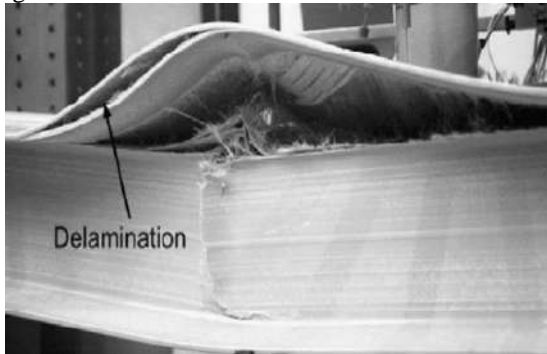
Shear failure in FRP bridge deck [1]
